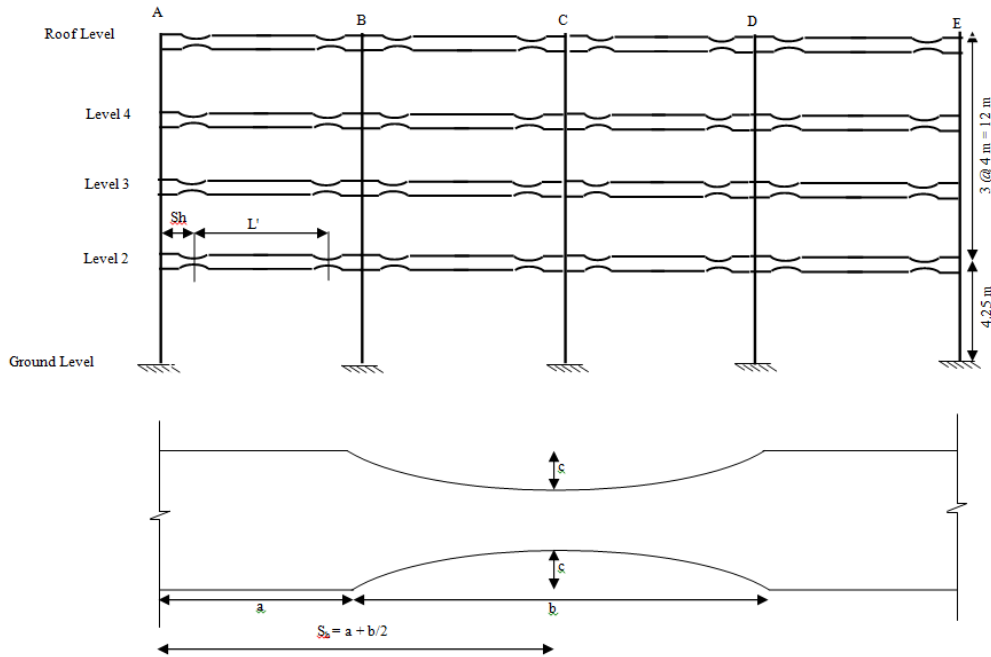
The Reduced Beam Sections designed for the Steel frame.
